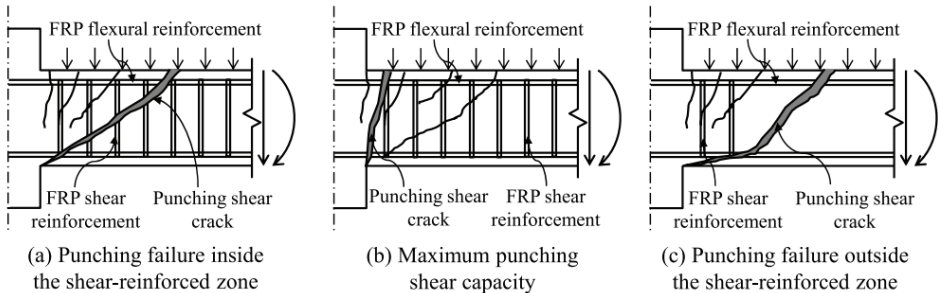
FRP-RC slab-column connections with FRP shear reinforcement show punching shear failure mechanisms [27].
